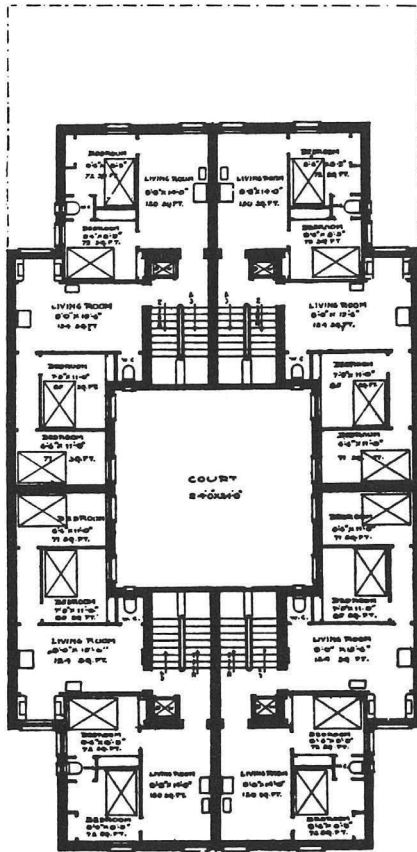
1900 Tenement Plan proposal submitted to the New York State Tenement House Commission showing a clear interior definition of domestic plan.
